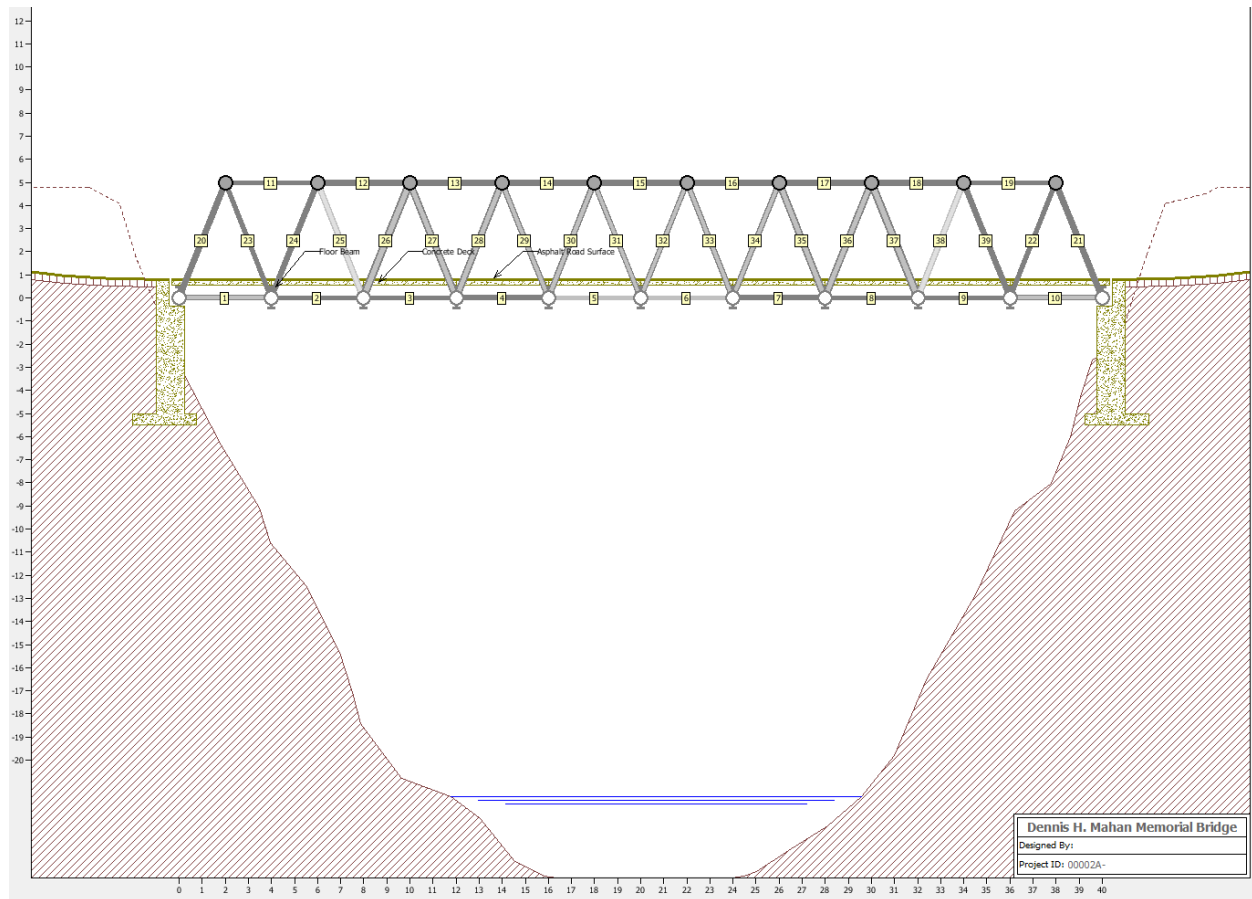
Warren Truss Bridge Model from Bridge Designer 2015
